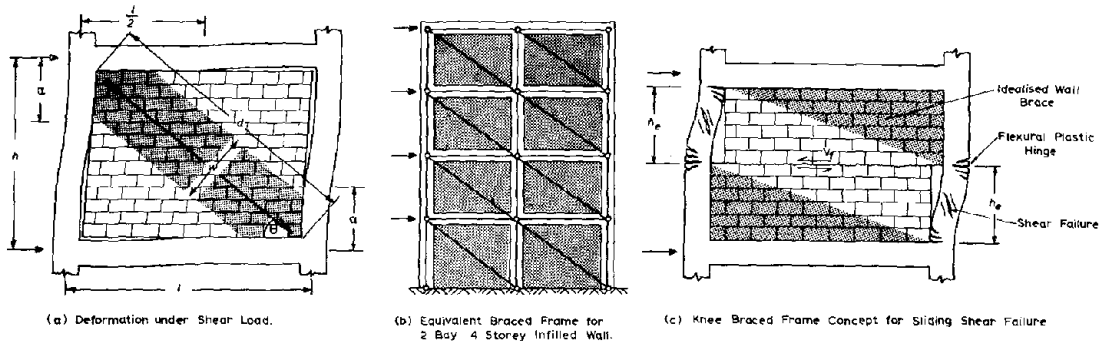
BEHAVIOUR OF MASONRY INFILLED FRAMES UNDER LATERAL LOAD
